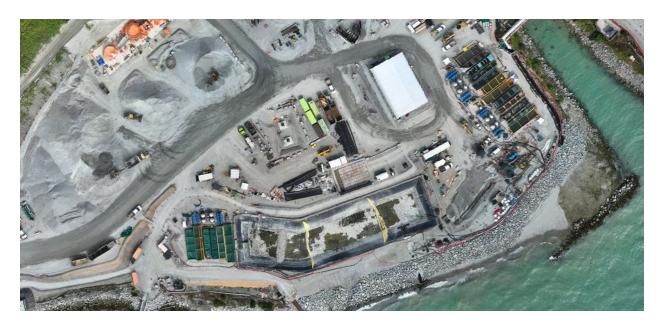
Aerial view of the West Sedimentation Pond (August 13, 2025). The West Sedimentation Pond was drained from July 30 to August 14 for cleaning and outfall pipe installation.
